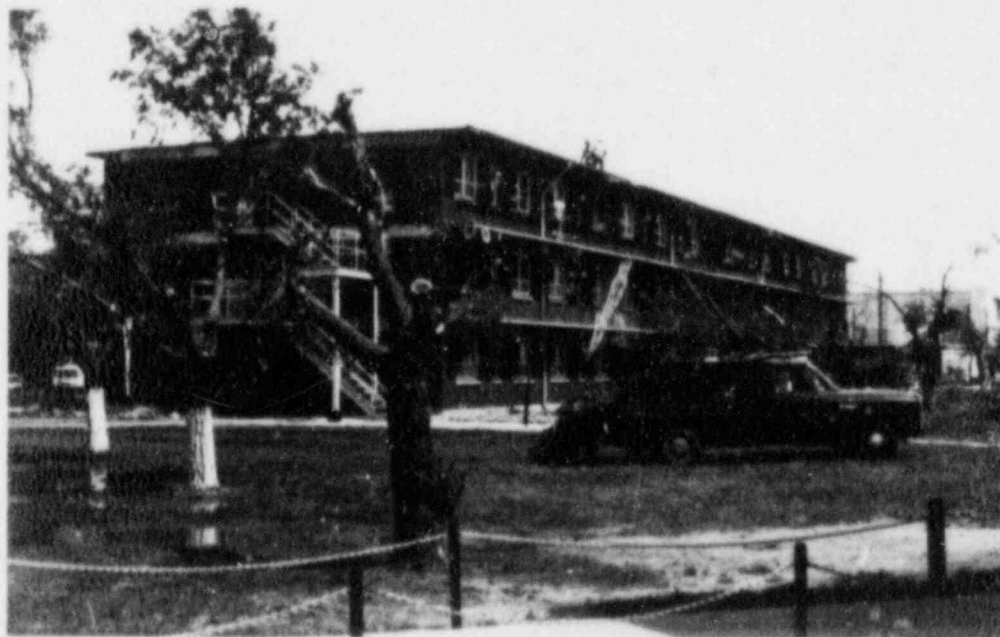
VIEW OF THE WINDWARD SIDE OF DORMITORY BUILDING #315 (the reinforced concrete structure has nonloadbearing masonry walls).
